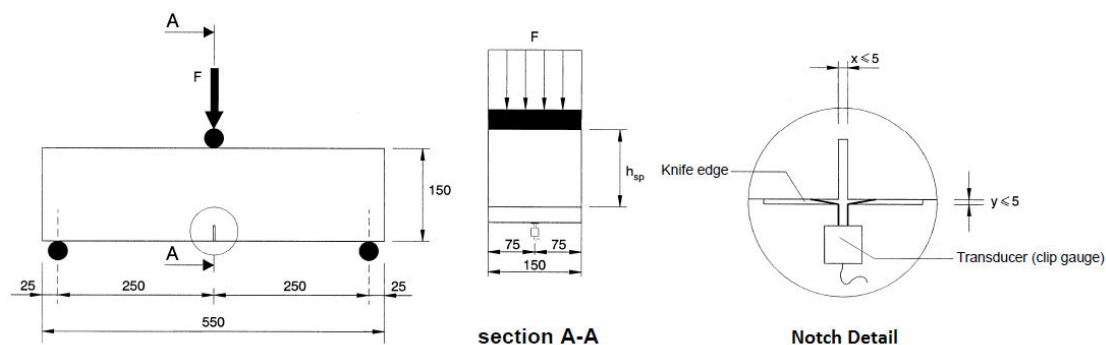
Typical arrangement for measuring CMOD (all dimensions in mm, [15])
